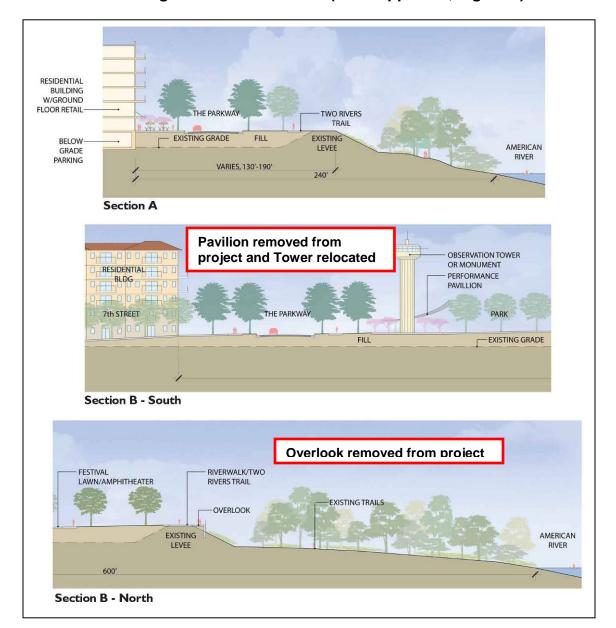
Site Sections (FEIR Appendix, Figure 5)
